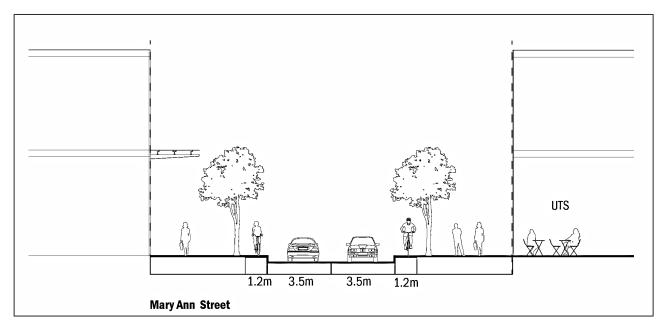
Site elevation / section 2: Mary Ann Street (Hassell)
